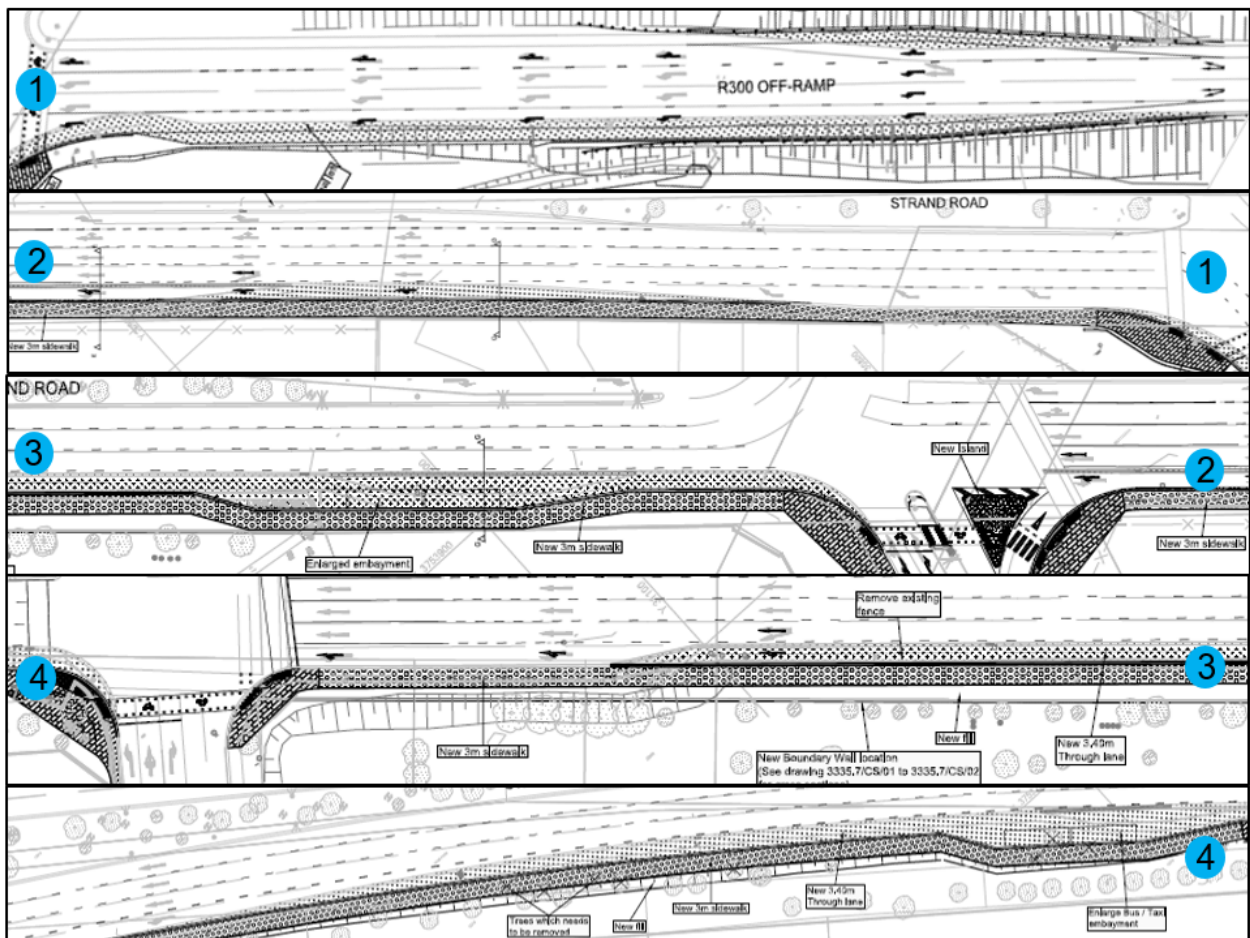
Road widening and NMT facilities along Strand Road (Source: ITS)
